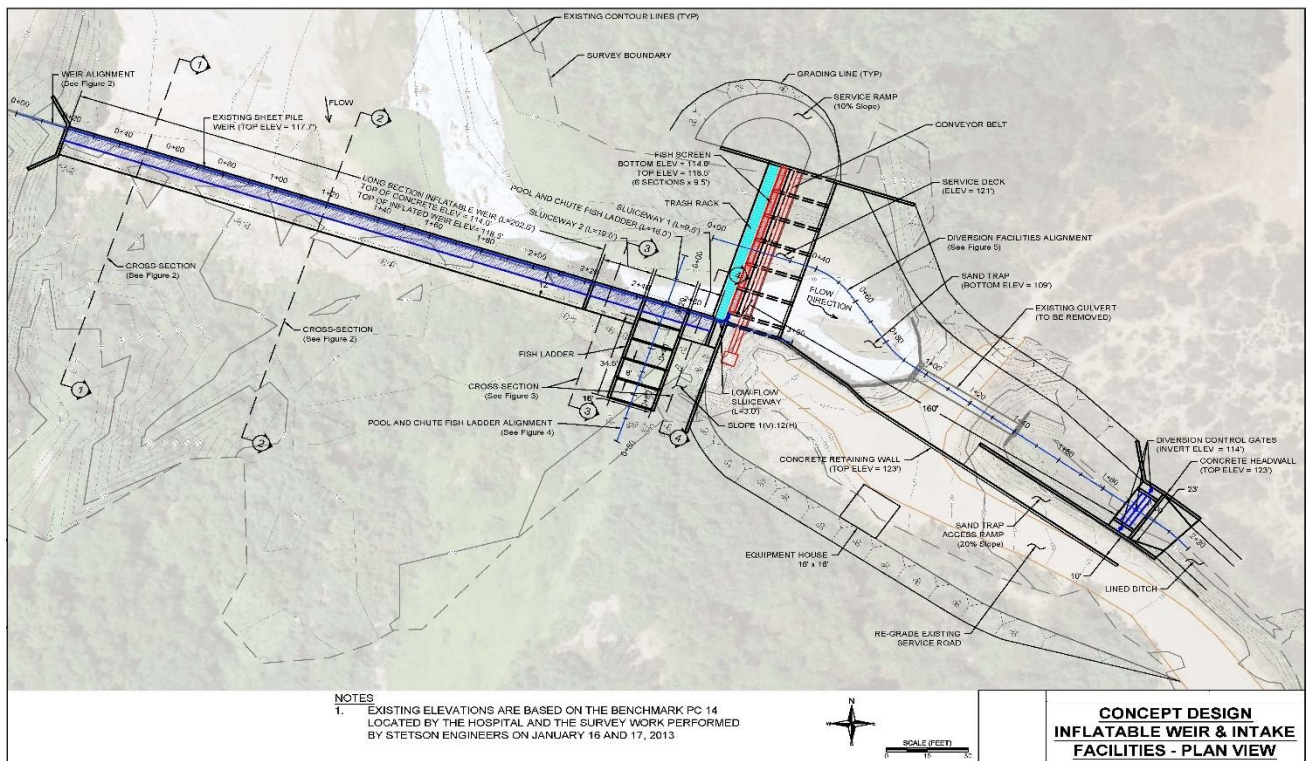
Concept Design for Proposed Weir and Intake Facilities
